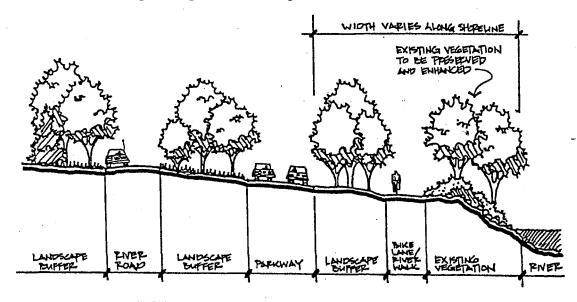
WEST RIVER ROAD STREETSCAPE
